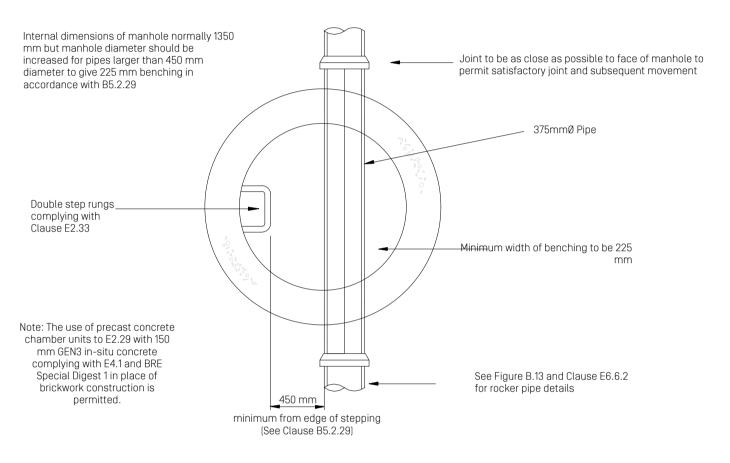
TYPICAL MANHOLE DETAIL - TYPE C
